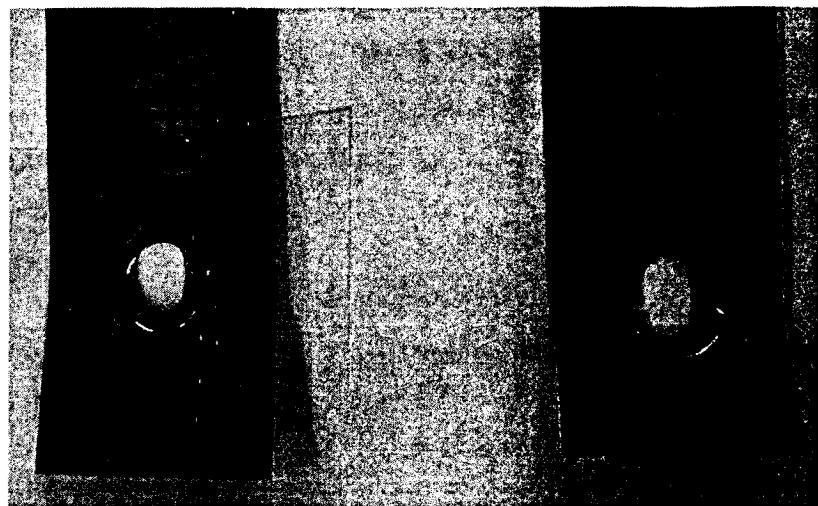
Type A Bearing Failure: 043-230-5/8-SS-C (left) and 043-230-5/8-SS-D (right)
